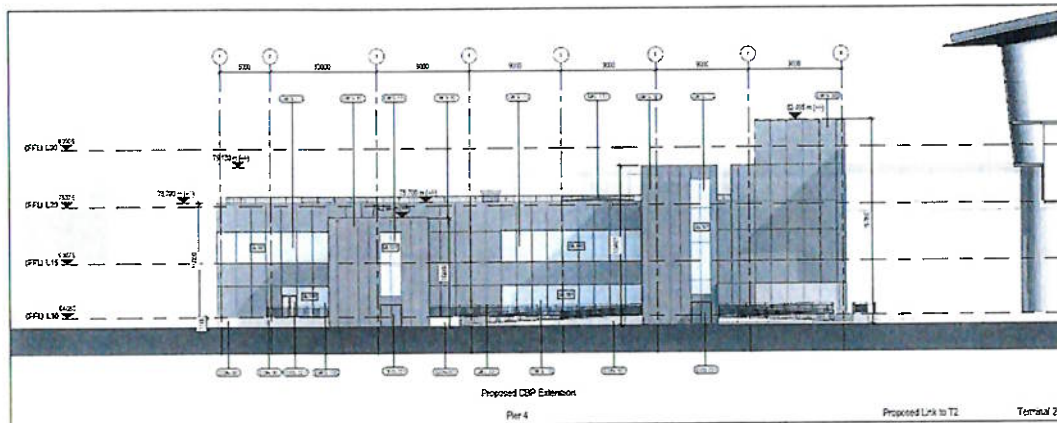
Proposed CBP eastern elevation (Pascall + Watson, 2023).
